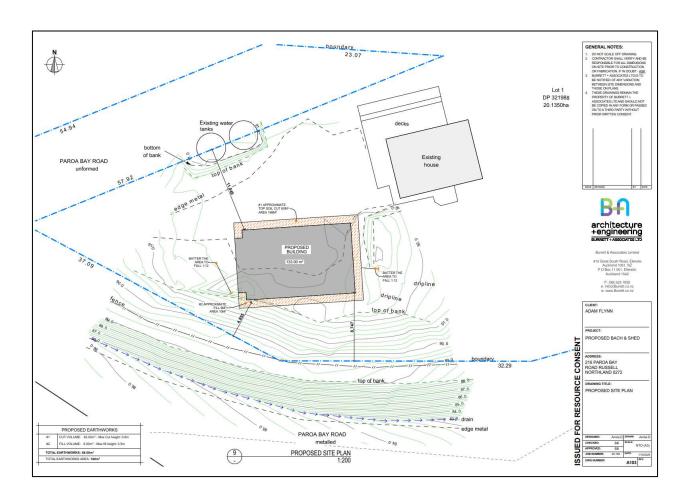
Site Plan, prepared by Burrett & Associates Limited, dated 01/10/25. (Full plan set found in Appendix 3)
